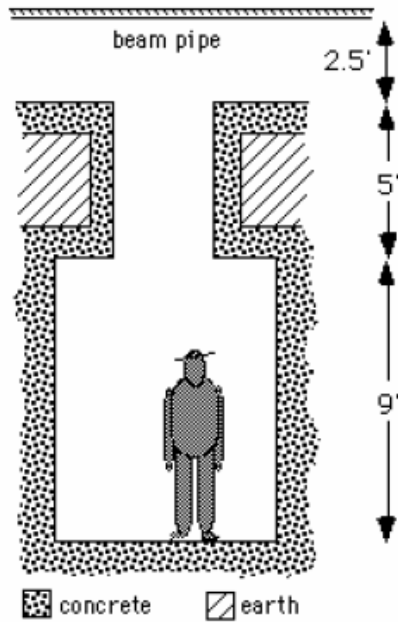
Cross-Sectional View of a Utility Tunnel and Manhole
